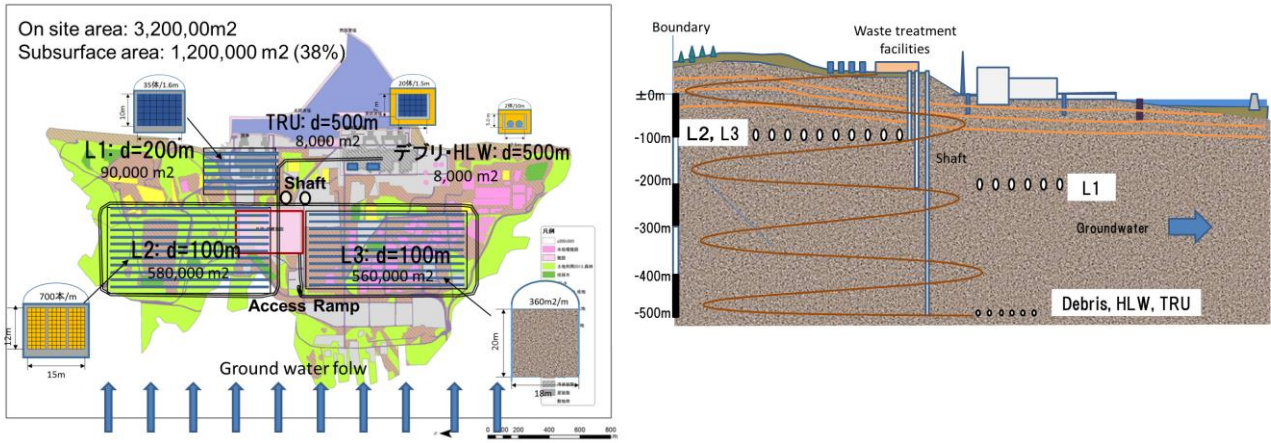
On-site disposal concept (left showing footprint, right depth profile of facilities)
